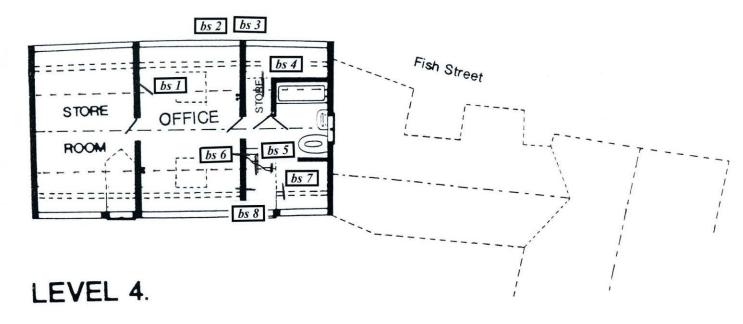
Second-floor plan, showing the location of timbers sampled in Bear Steps Hall, Gallery, and The Orrel (after Moran 1989 © Shrewsbury Civic Society)
